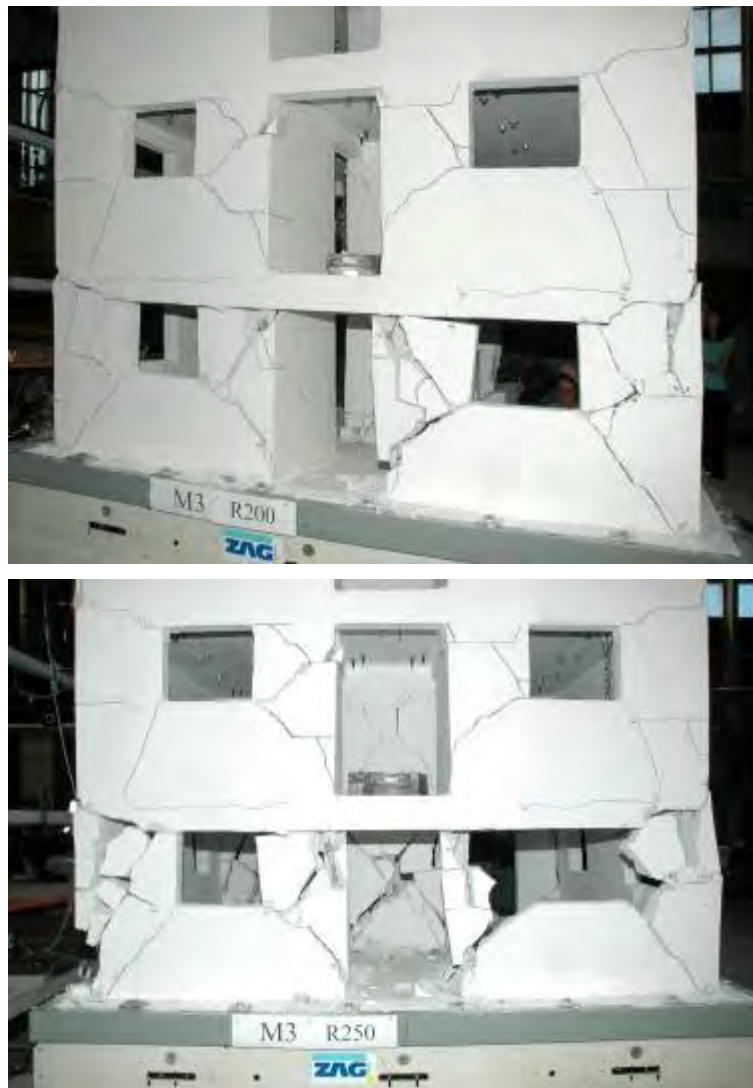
Severe damage to the walls in the ground floor and heavy damage to the walls in the first storey near collapse of model M3 after test run R250 [55].
